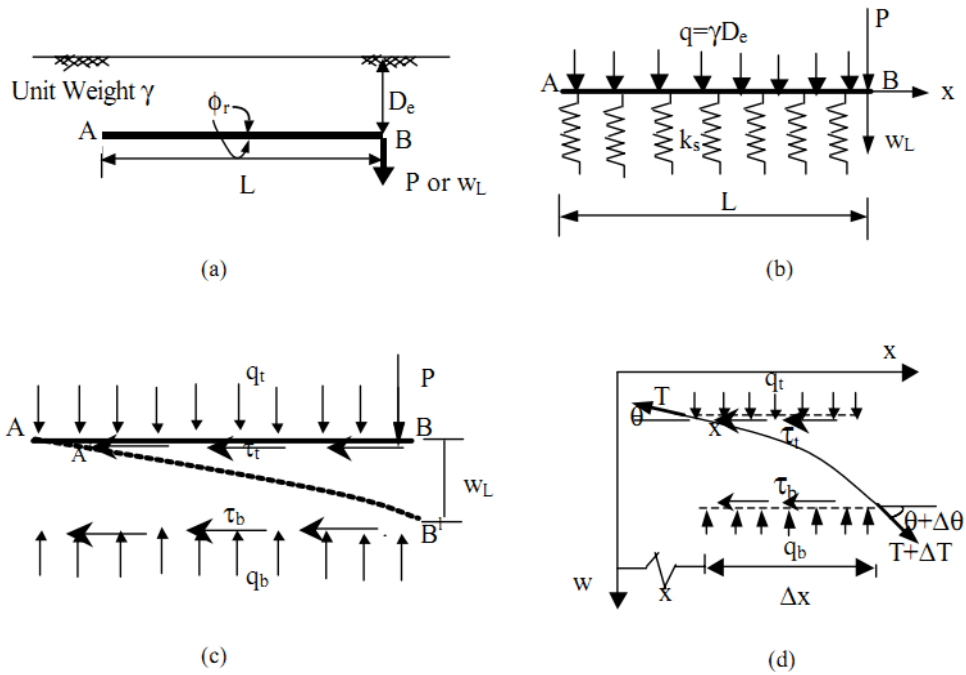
(a) Reinforcement subjected to transverse force, (b) Model, (c) Deformed profile and (d) Forces on an element.
